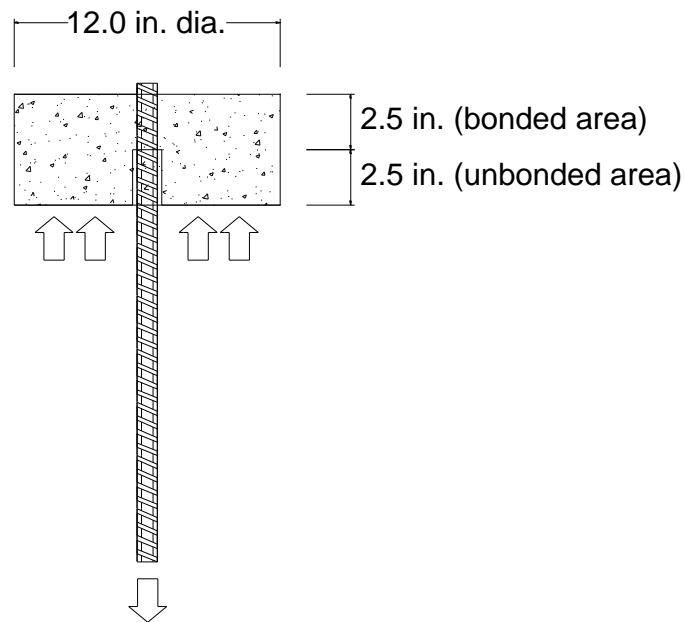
Dimensions for pull-out specimen testing No. 4 bar
